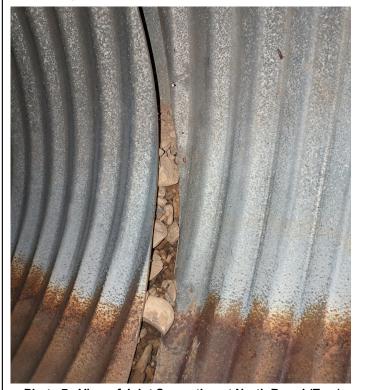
View of Joint Separation at North Barrel (Typ.)
